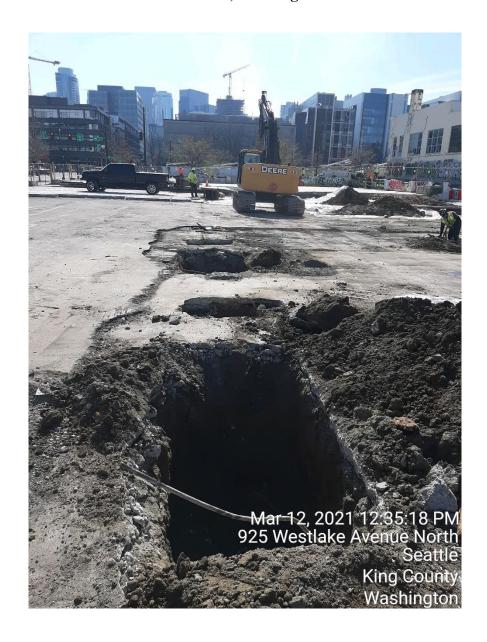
Above right. Hoist-5 being pulled from the ground.
